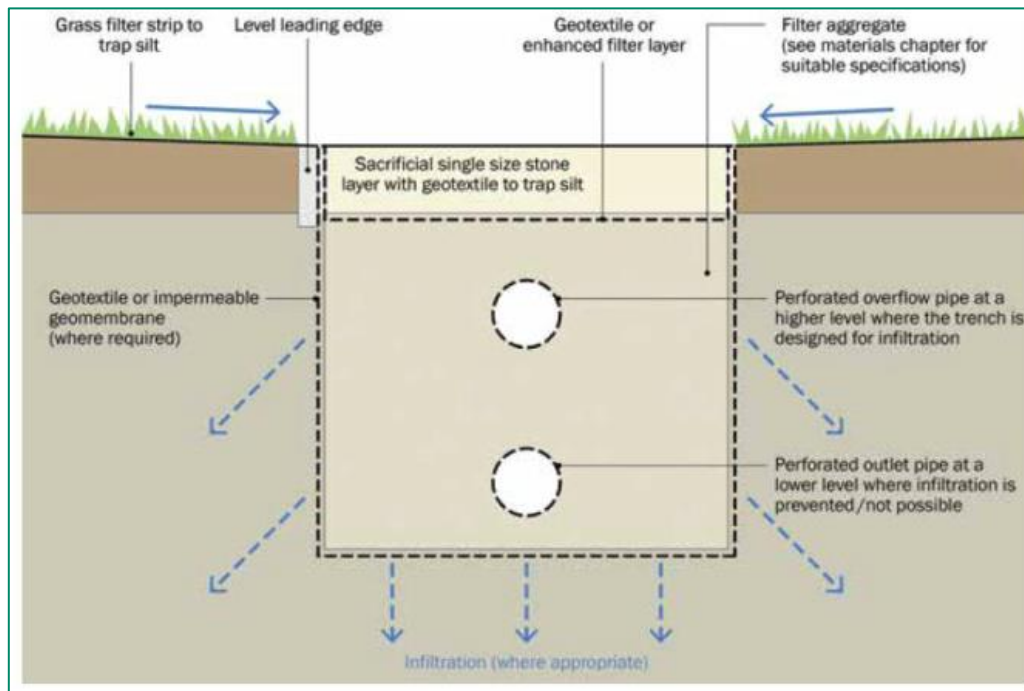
Typical Filter Drain Detail (Source: CIRIA SuDS Manual C753)
